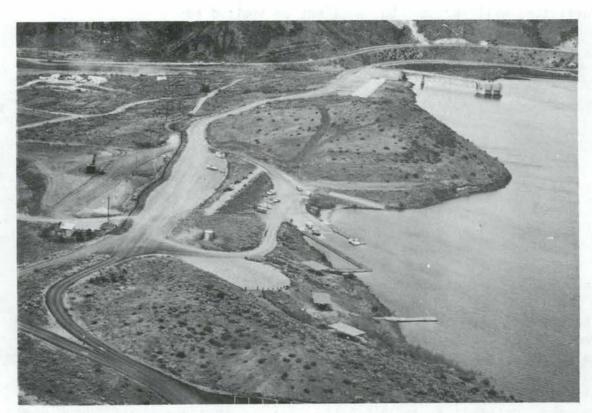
Barclay Bay - Parking facilities and launching ramp are to be expanded.
